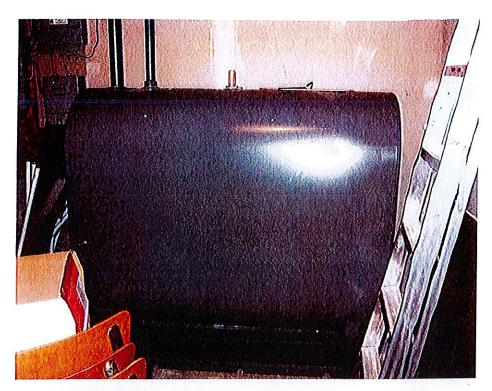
Heating oil tank located in the basement. Possible benzene present.
